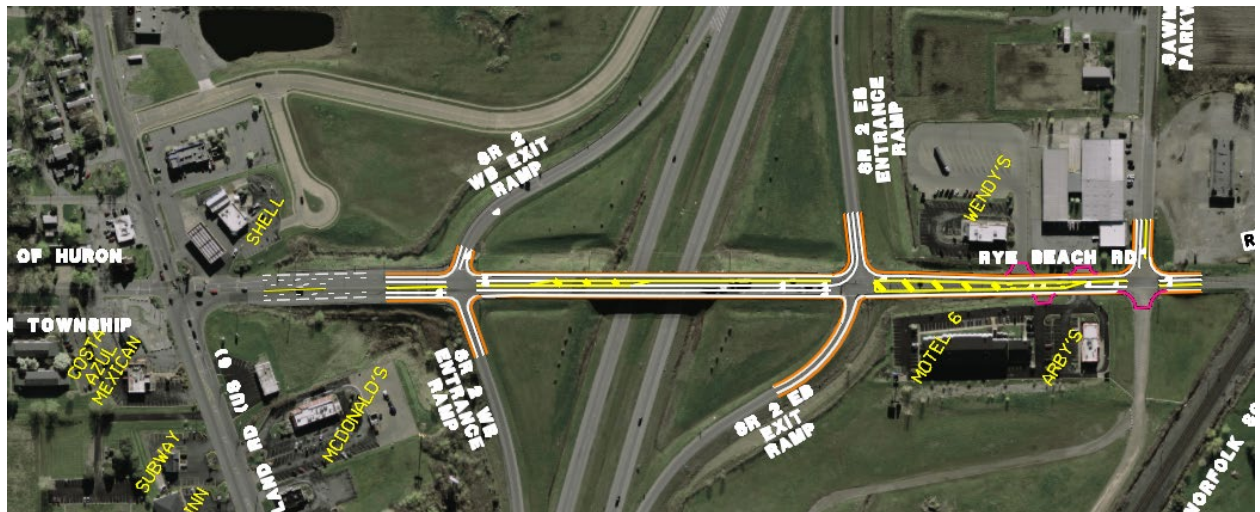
Rye Beach Road Alternative F2 – Rye Beach Road Restriping
